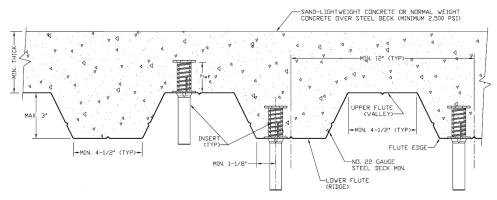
A—BANG-IT+ INSERTS INSTALLED IN SOFFIT OF CONCRETE-FILLED STEEL DECK FLOOR AND ROOF ASSEMBLIES^{1,2,3,4,5}
